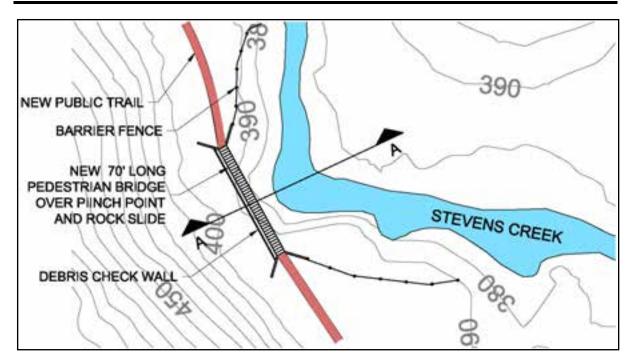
Combined Design with Structural Boardwalk Spanning Narrow Bank between Stevens Creek and Slumping Canyon Wall.
